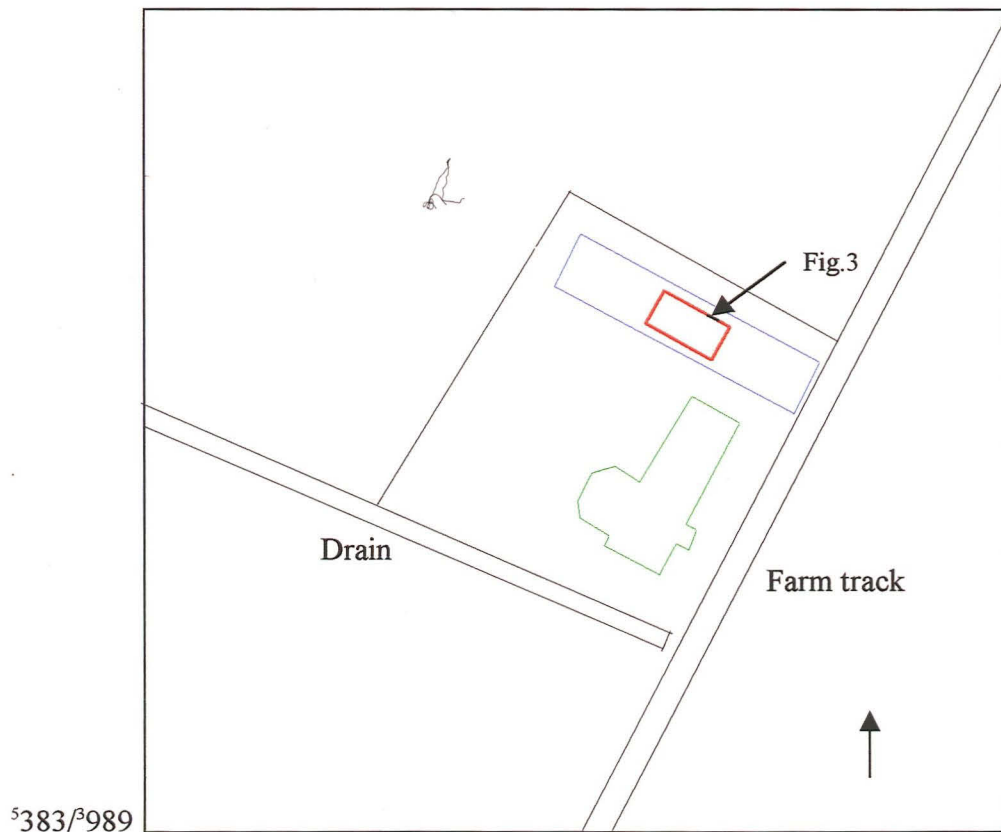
Scale 1:1000. Plan showing location of existing bungalow in green, construction trench for swimming pool in red; and swimming pool building in blue
